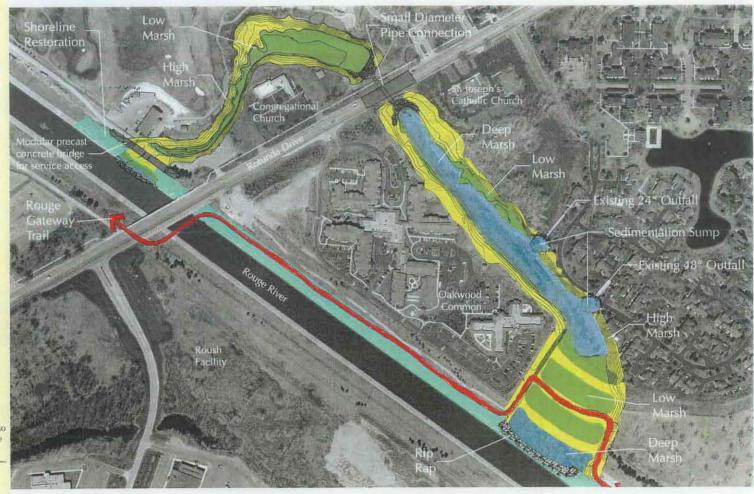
OAKWOOD COMMON SITE LOCATION PLAN
